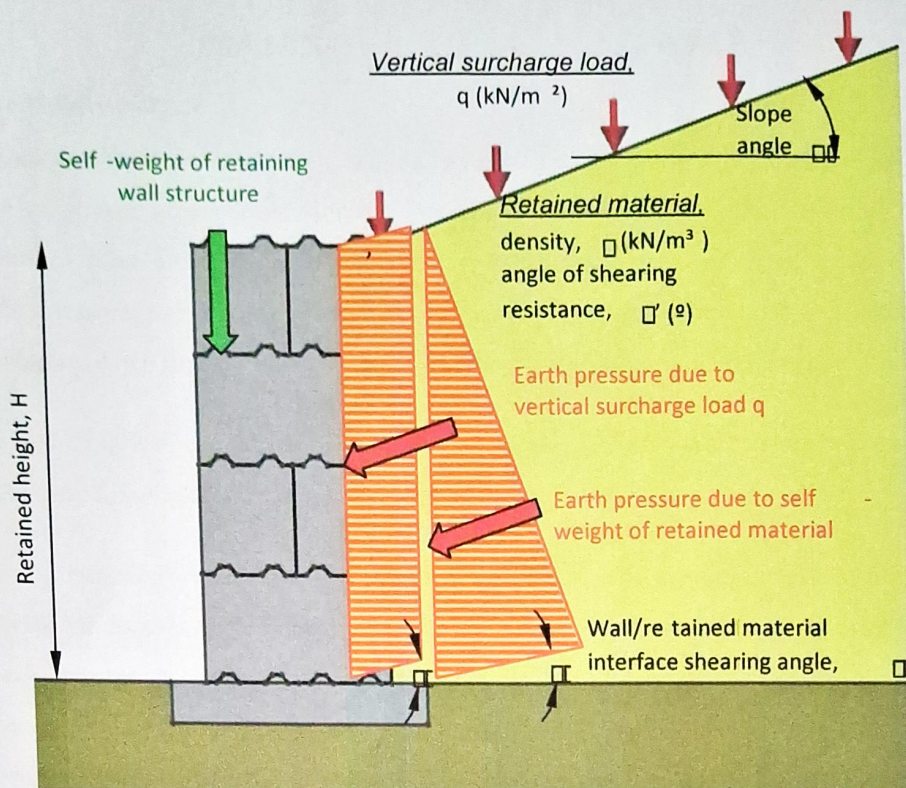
Favourable and unfavourable actions applied to gravity retaining wall
